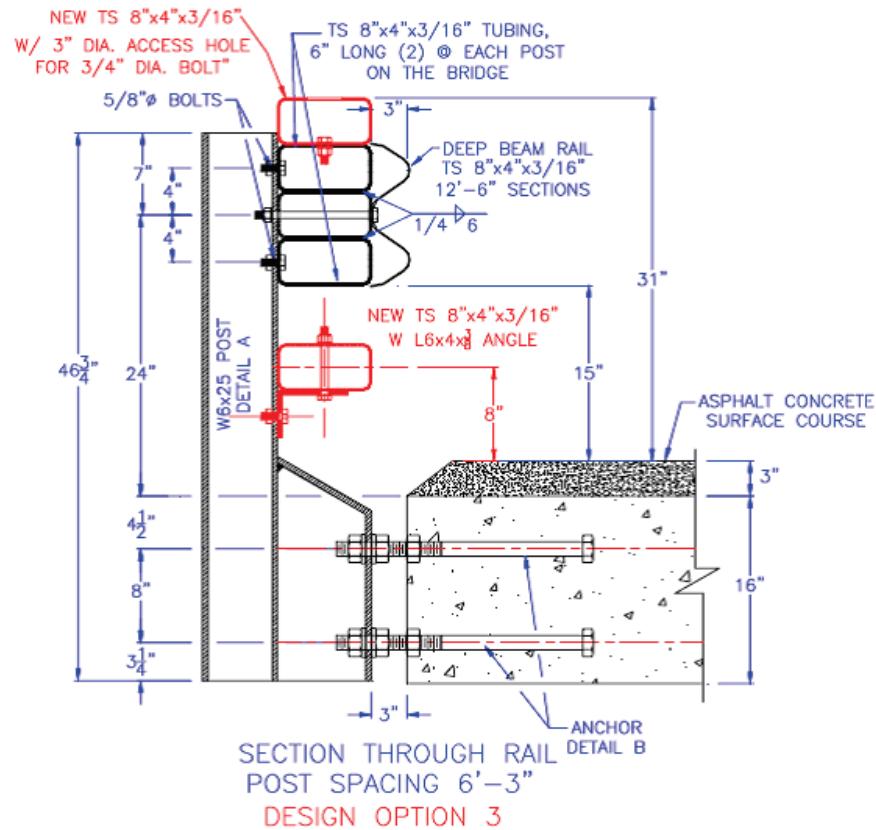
Modified Ohio Deep Beam TL-3 Bridge Railing Design (6 ft-3 inch Post Spacing)
